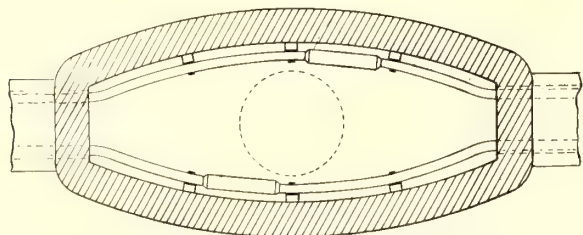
PLAN OF ELLIPTICAL MANHOLE
